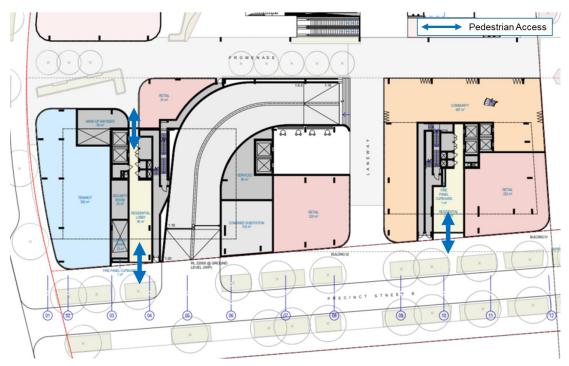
Pedestrian access to/from Building 2 and Building 3
